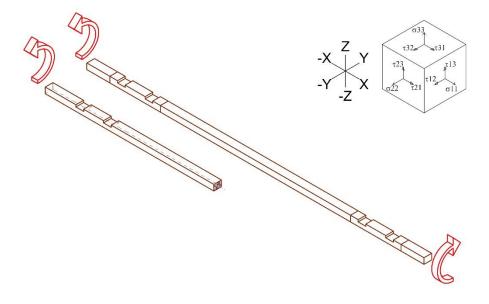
Roof Rafter - Torsion: Mx on x axis
